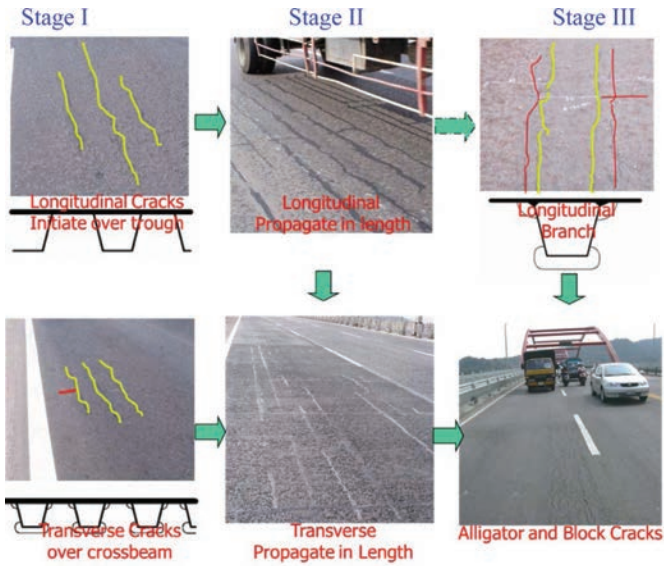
Fatigue cracking of pavements on orthotropic steel decks and its propagation.
